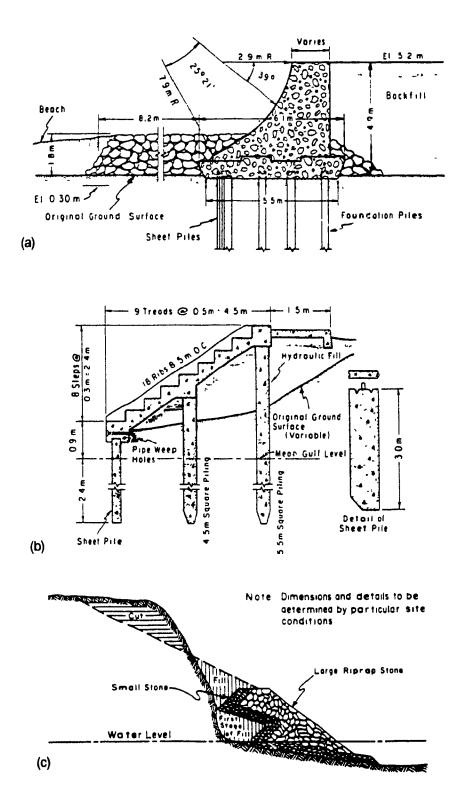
TYPICAL SEAWALL STRUCTURES (a) CURVED-FACE SEAWALL (b) STEPPED-FACE SEAWALL (c) RUBBLE-MOUND SEAWALL'
